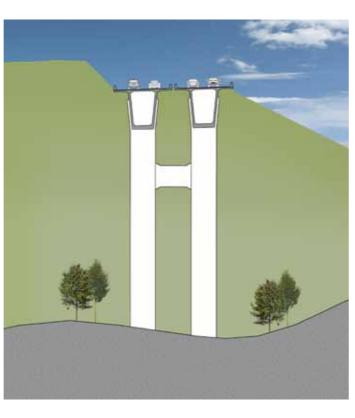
Bridge 20 Cannons Creek Bridge cross section
